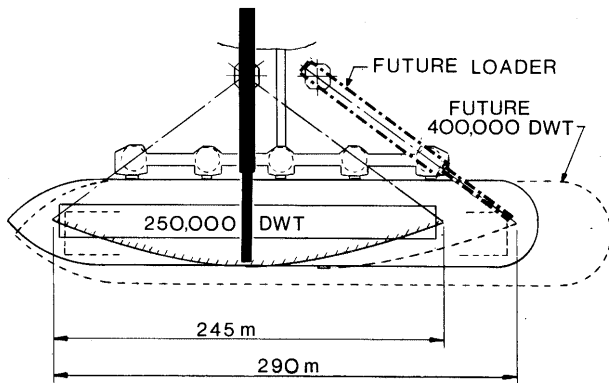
Caisson Construction—At Narvik, a concrete box girder runway is supported on five 13.8 meter diameter concrete caissons and four intermediate vertical pile bents. Initial 11,000 TPH Linear Loader covers 250,000 DWT vessel. In the future, vessels up to 400,000 DWT will be loaded at 22,000 TPH by adding a second Linear Loader on same foundations.
